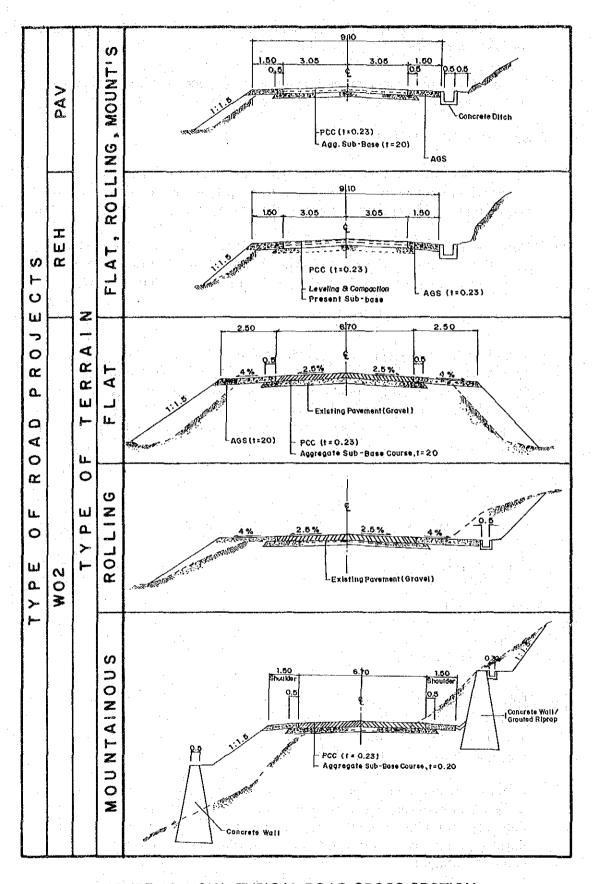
(1) TYPICAL ROAD CROSS-SECTION
